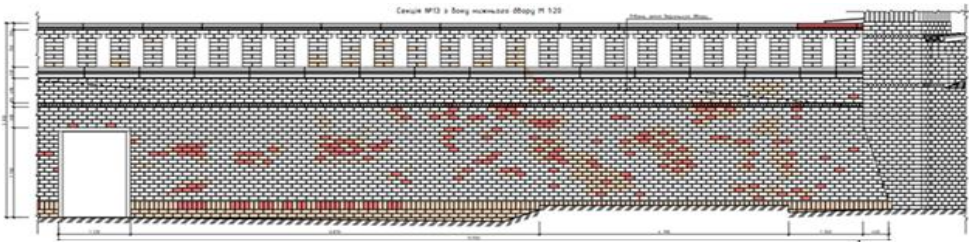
Cartogram of damage to the brickwork of the surface of the retaining wall, made by students under the supervision of I. Korotun, 2020
